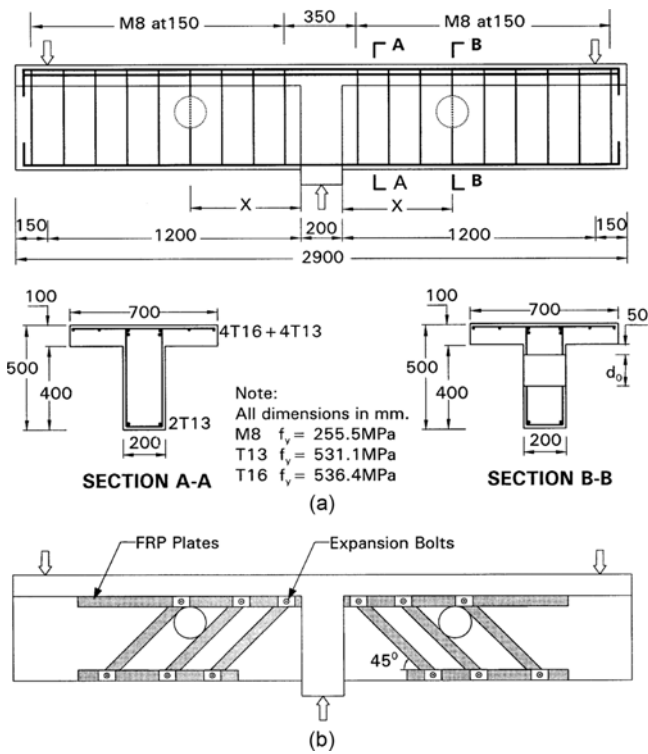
Details of Beams (Mansur *et al.*, 1999): (a) Reinforcement Details of Beams, (b) Arrangement of FRP for Beam D<sub>15</sub>X<sub>4</sub>-F
